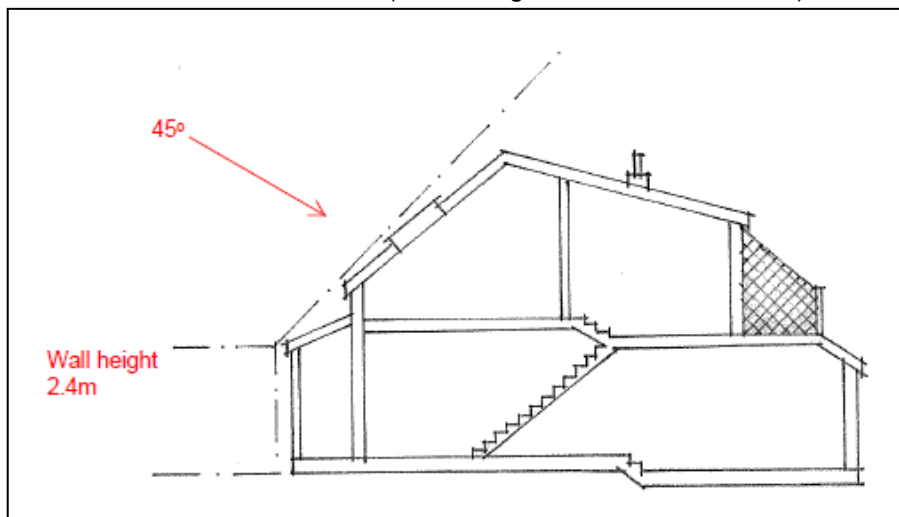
Building envelope – 2.4m wall height – Single storey, similar to the scale of a workers’ cottage.
